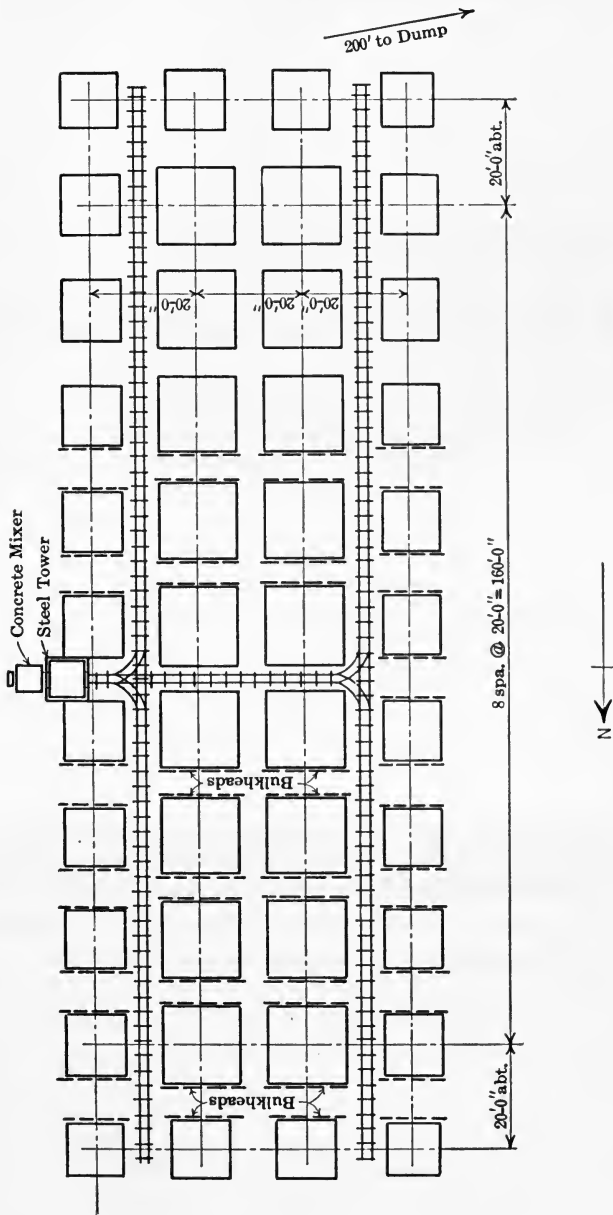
Excavation plan of reinforced concrete industrial building.
